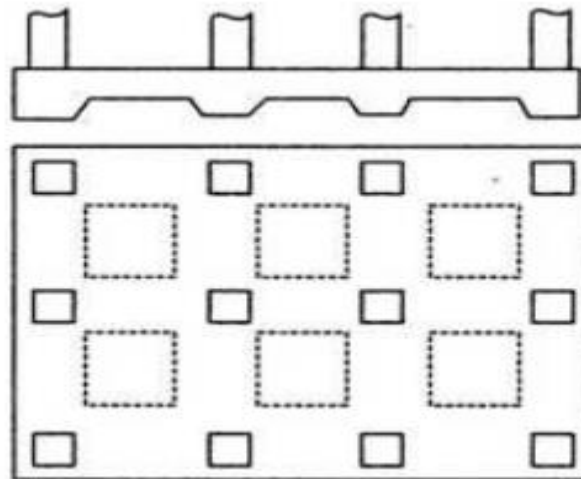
Plan and elevation of Raft Foundation for water Tanks
